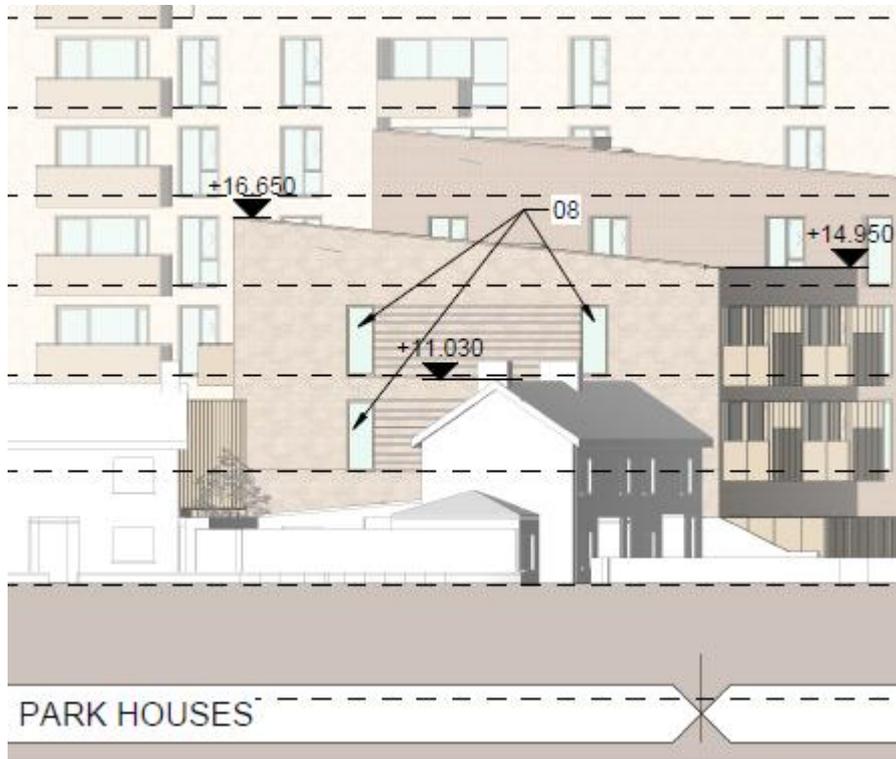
3-storey elevation facing 15/16 Dwyer Park (extract from Contextual Elevations)
